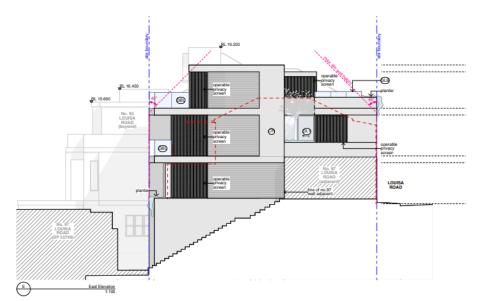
proposed east elevation with all three levels of glazing screened, improving privacy.
